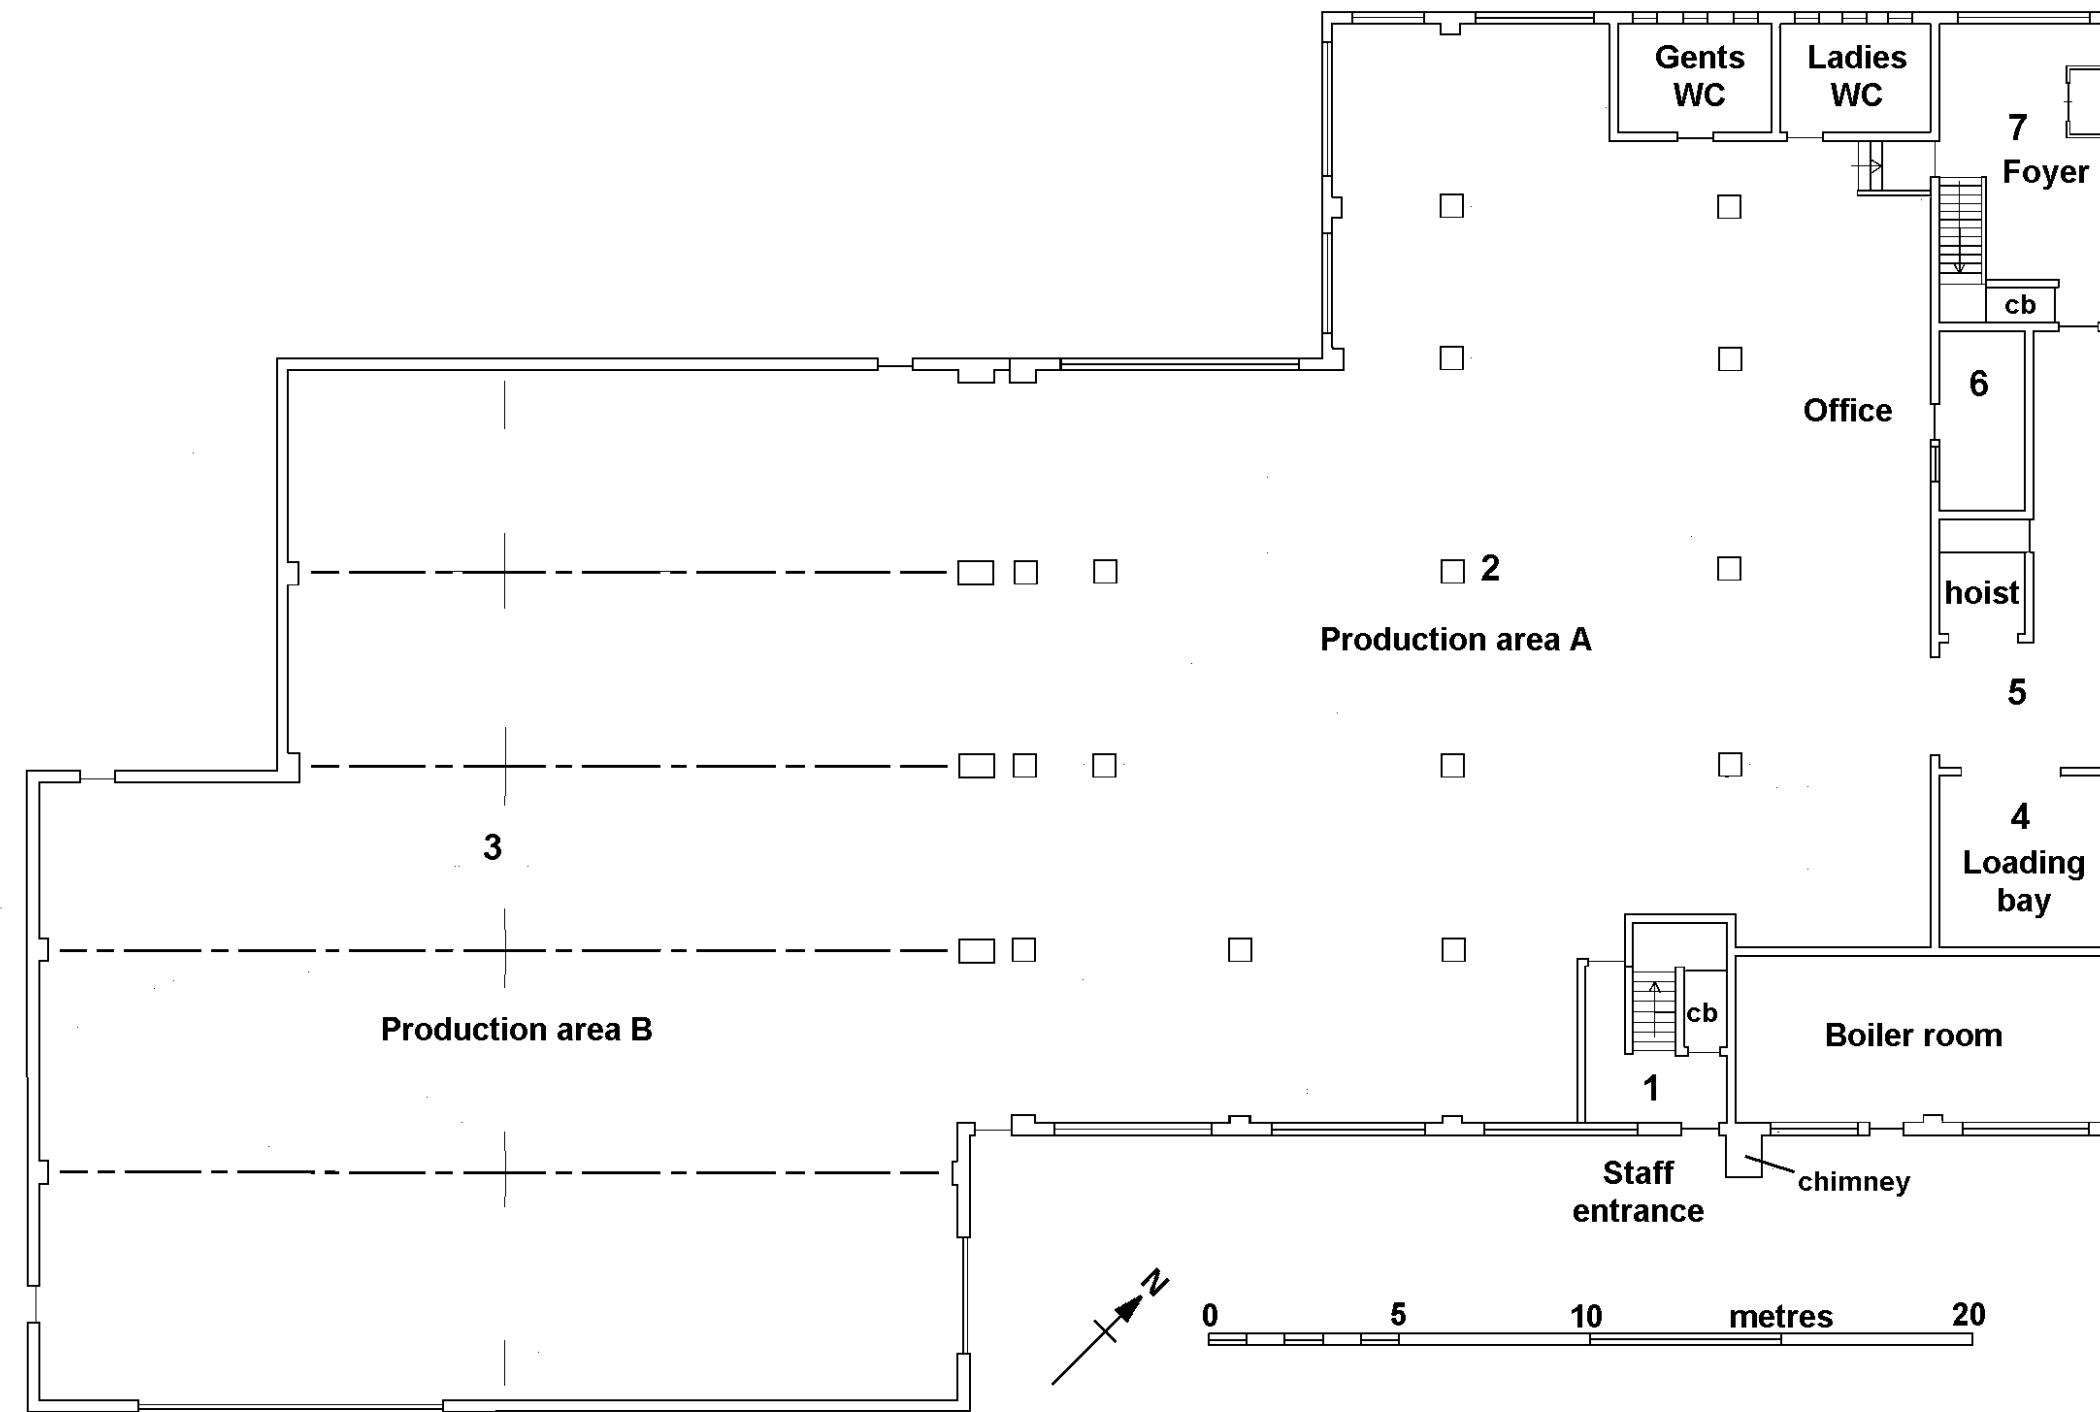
Building 1, ground floor plan (*scale 1:200*)
